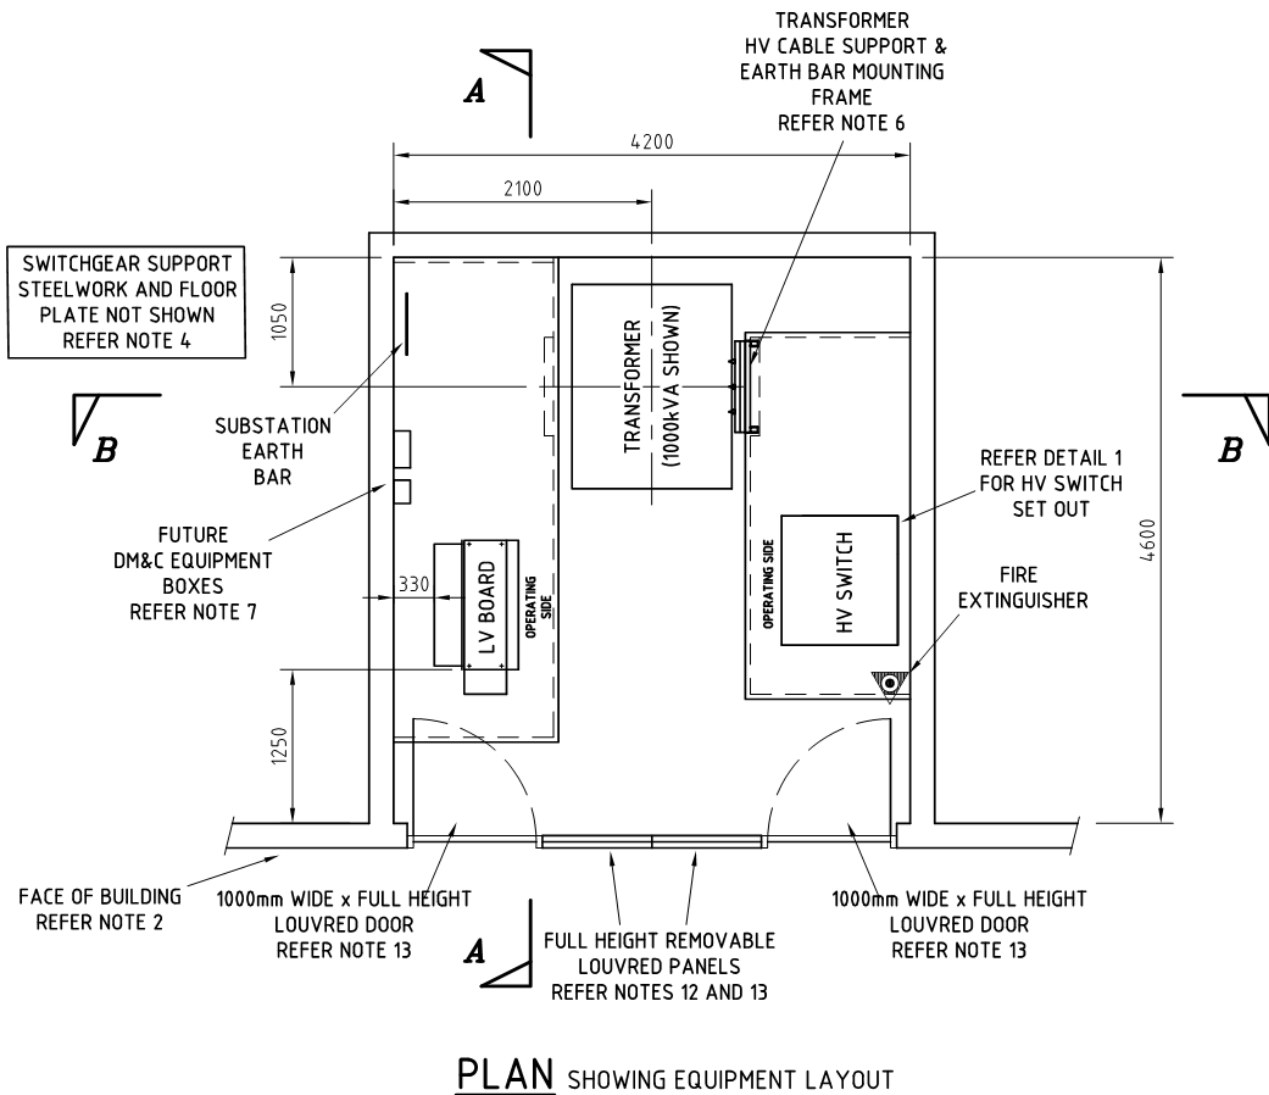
Standard Ausgrid Surface Chamber Substation - General Arrangement Layout
